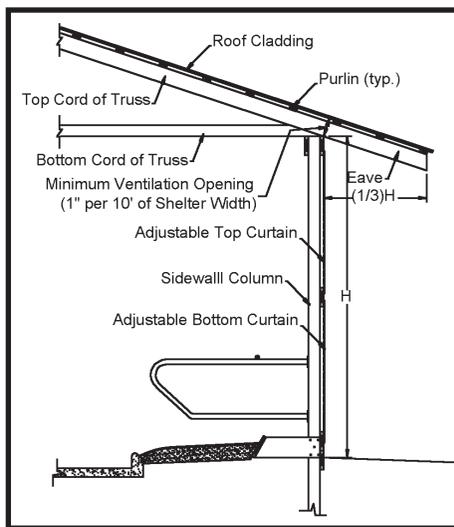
Curtain sidewall for a naturally ventilated shelter. Sidewall height, H, should be a minimum of 12' for 2- and 3-row open front shelters with 14' preferred for 3-row units.
